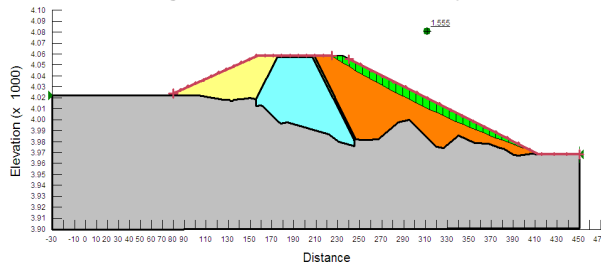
Slope Stability Section of Downstream Face at Stage 1 (Impoundment Empty)
